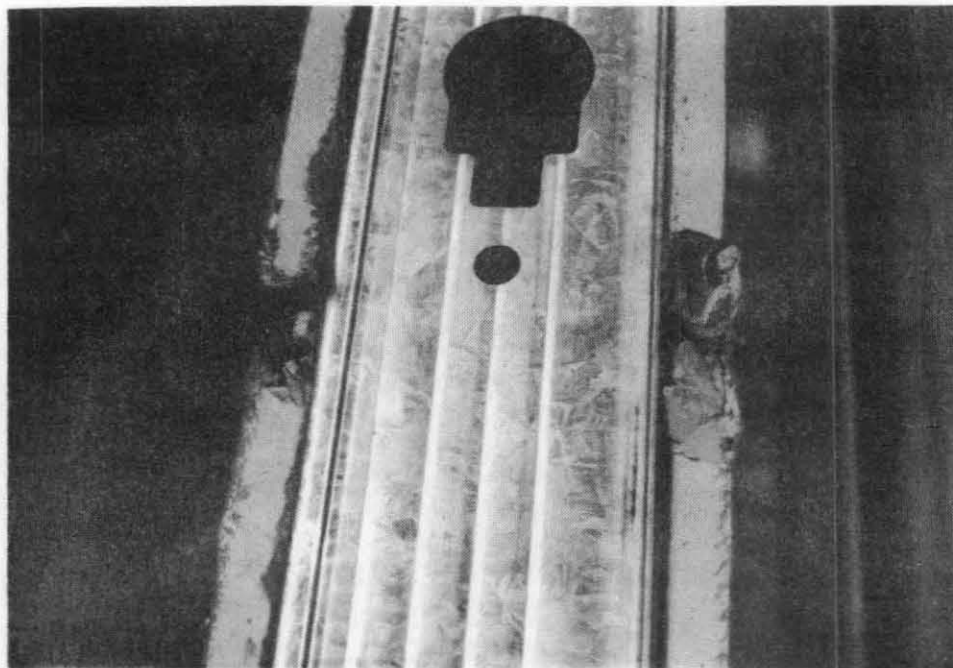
Partition Specimen P4: Gypboard Failure @ End Stud
